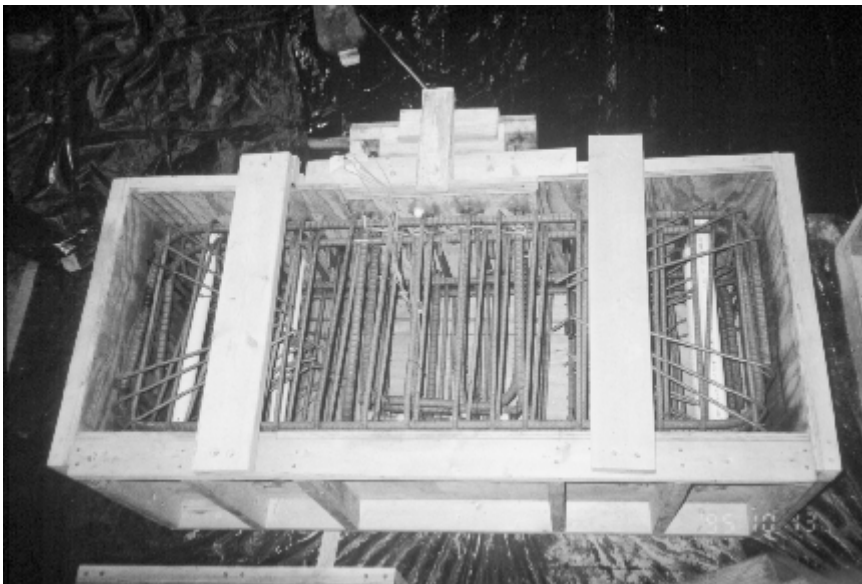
View of Reinforcement and Formwork (Specimen MC1)
